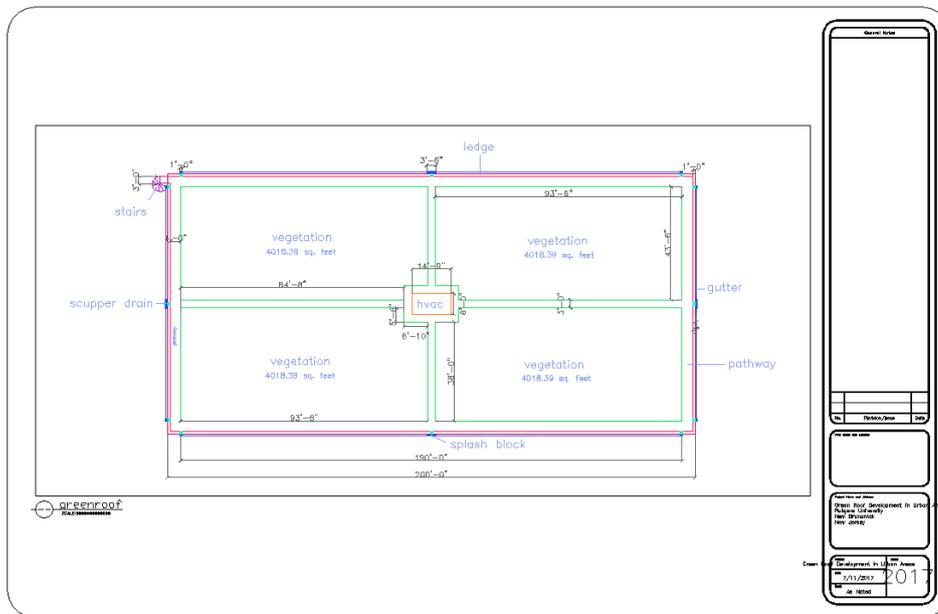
Aerial view of green roof rendered in AutoCAD.
